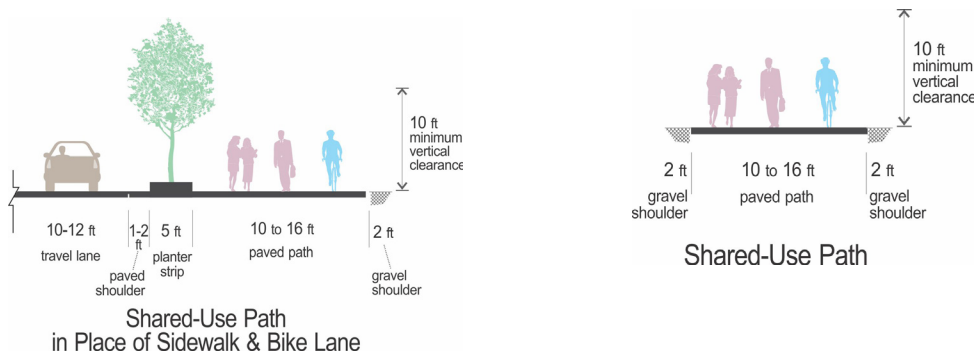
Proposed Shared-Use Path Typical Cross-Section Standards and Alternative Minimum Standards
